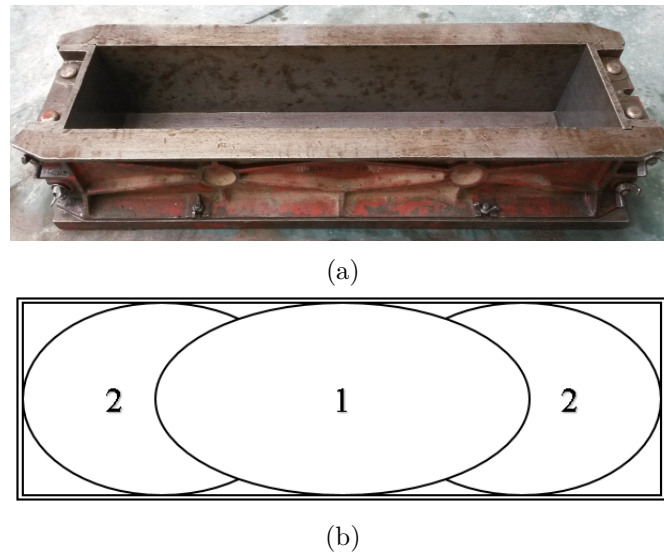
(a) 150x150x700 mm Steel mould and (b) Sequence of filling the mould
